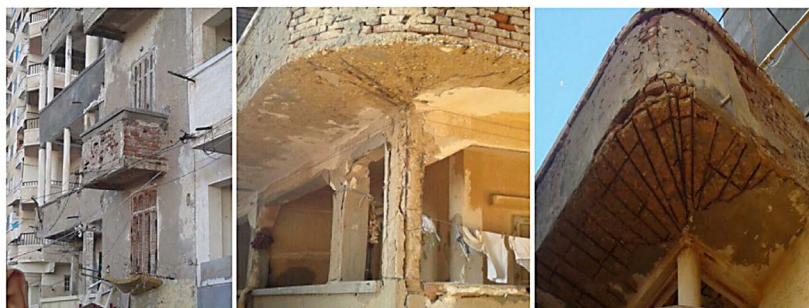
Signs of environmental attack on reinforced concrete buildings in Alexandria, Egypt. (a) Erosion of old building frontage. (b) Development of cracks in columns and slabs. (c) Total concrete cover spalling.
